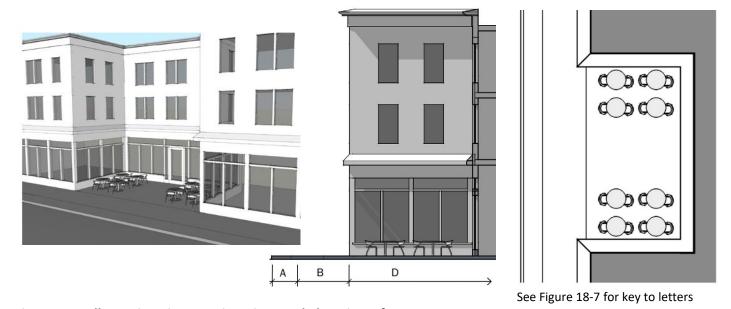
Illustrative View, Section View, and Plan View of Forecourt Frontage Type
